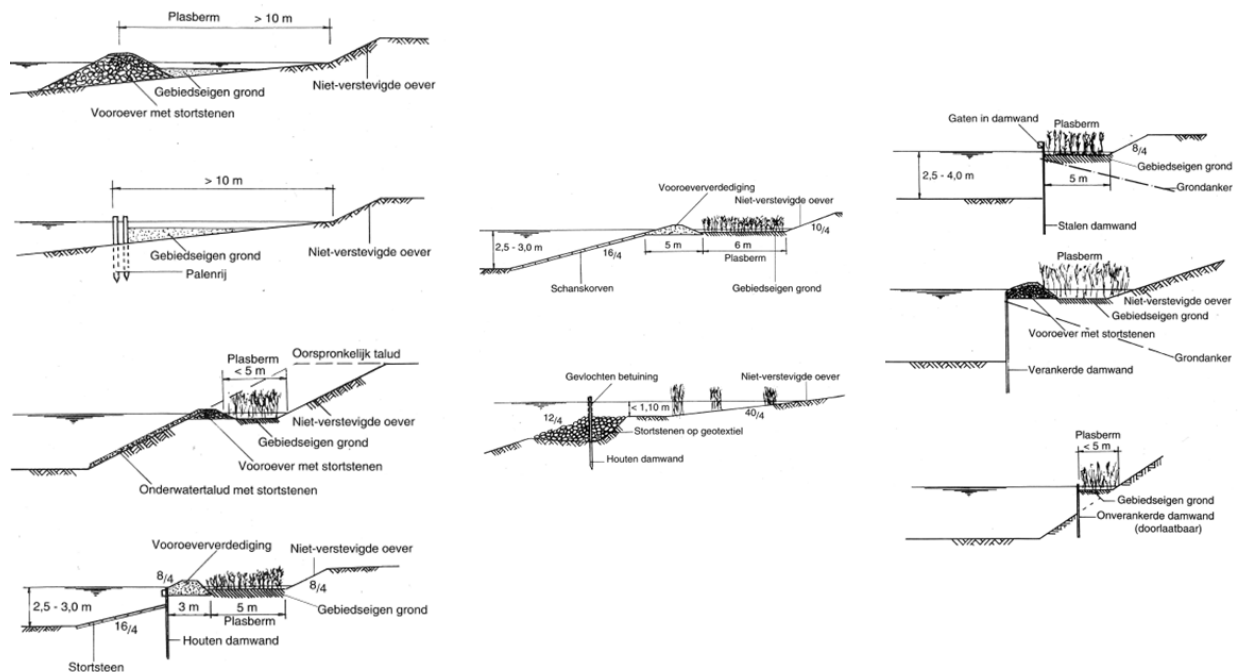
Cross sections of embankments for waterways (left and middle) and canals (right) in the Vademecum Natuurtechniek (1994)
